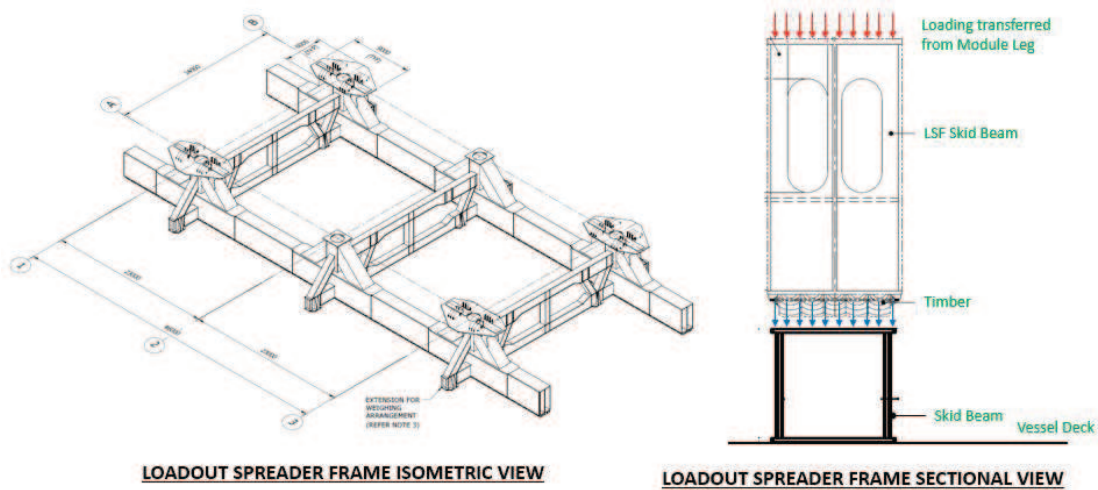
Loadout Spreader Frame Isometric and Sectional View
